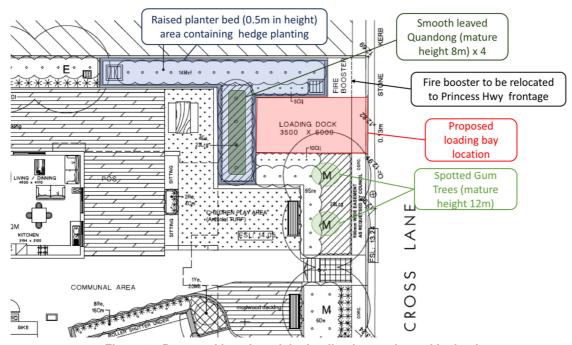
Proposed location of the loading bay as framed by landscape treatment
